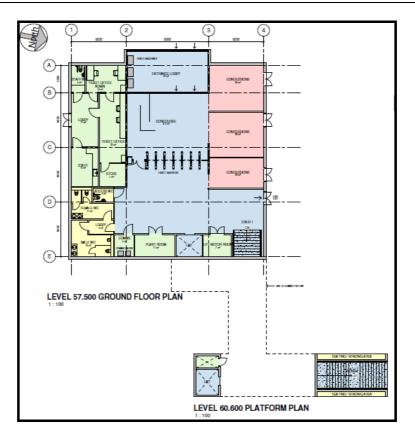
Western Entrance, Proposed Floor Plans – Pedestrian 'surface' level
